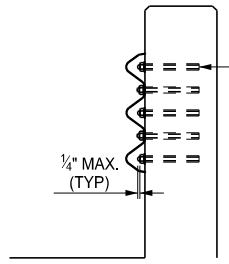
DETAILS FOR CONNECTING GUARDRAIL TYPE B TO FILLER WALL OR PIER STRUT
